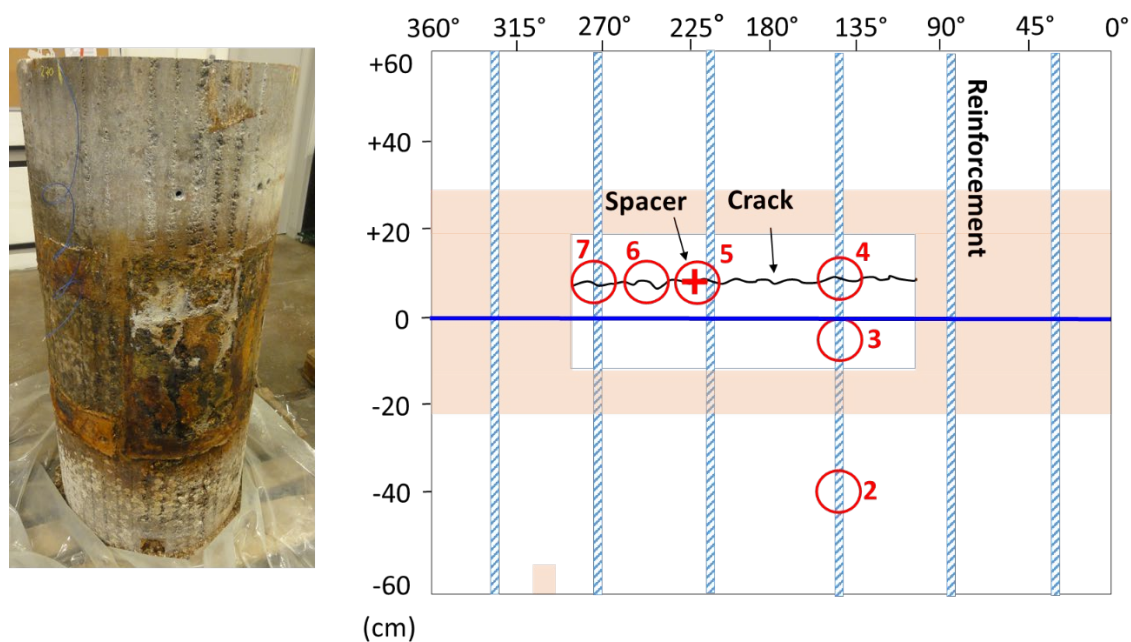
Tidal section of the concrete column Left: After removal of steel (rust stains from steel frame). Right: Sketch. Red circles show the locations where concrete cores were drilled. The vertical reinforcement bars (blue patterned lines) and the position of the steel frame (beige) are marked. The dark blue line indicates the location of the mean water level. The ordinate indicates the location on the periphery, “0” corresponds to south west).
